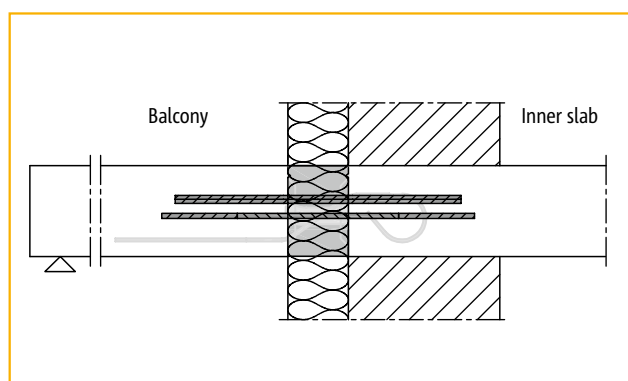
Brickwork with external insulation and a balcony at inner slab level + type QXT + HPXT-C module
